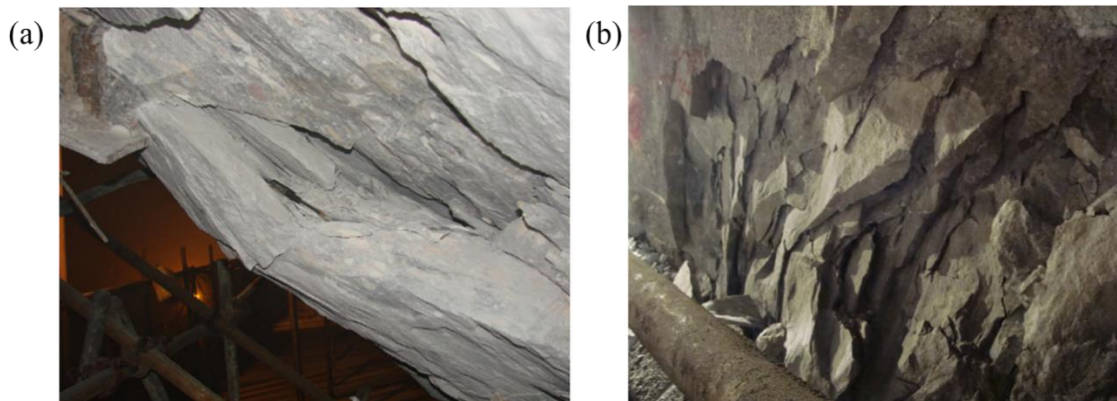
(a) Flake fractures, (b) sheet cleavage (Wu et al. 2010a)
